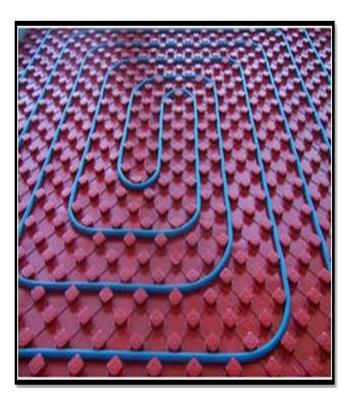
Watered Underfloor Heating System (http://www.dakservice.co.uk/underfloor-heating)
